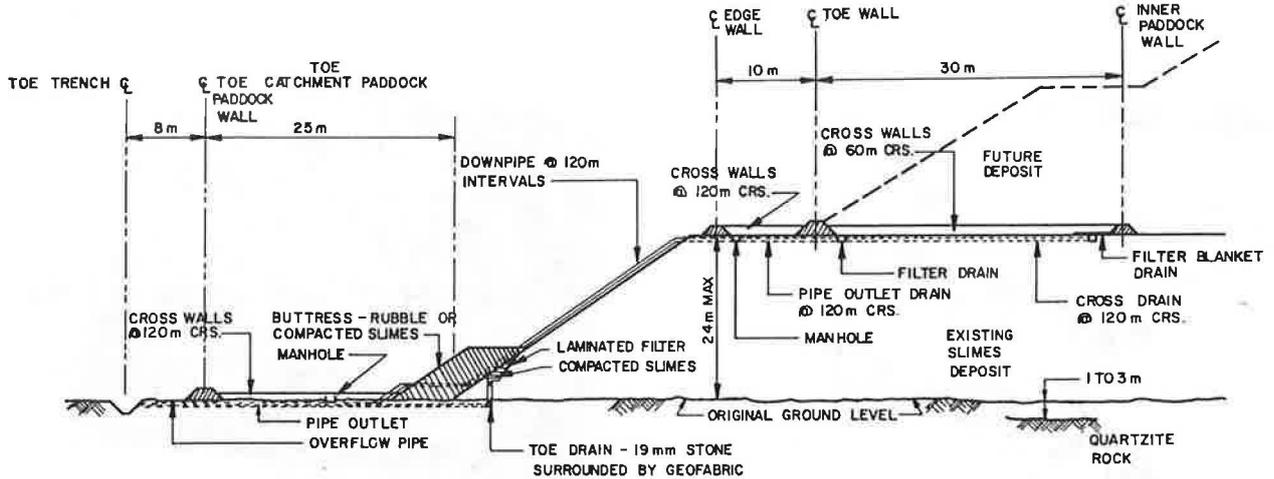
Crown Sand Slimes Disposal - Typical section on existing dam
